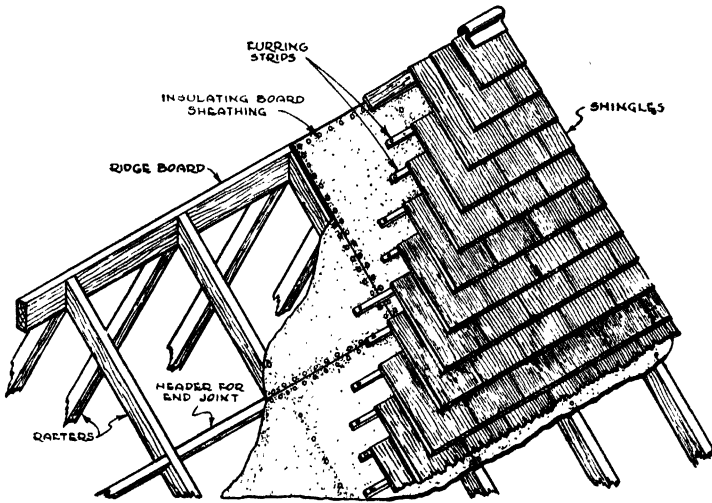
Structural Insulating Board Used under Shingles (or Slate) on Roof
